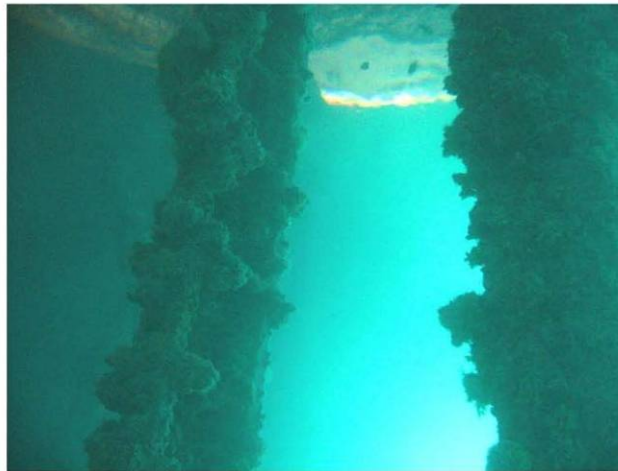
Underwater view of pilings at Star Wharf. Piles were constructed of steel and concrete and were heavily encrusted by a variety of fouling organisms.
